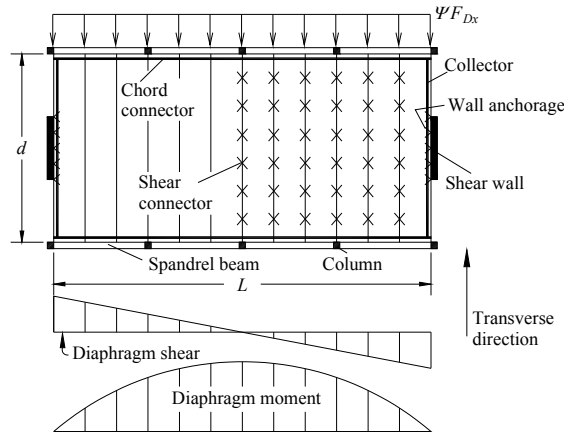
Typical precast floor plan used for evaluation structure.
